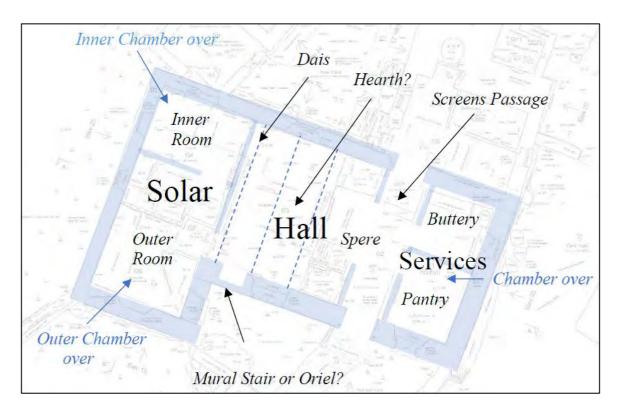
Suggested medieval ground-floor plan, superimposed on a plan of 2013.
